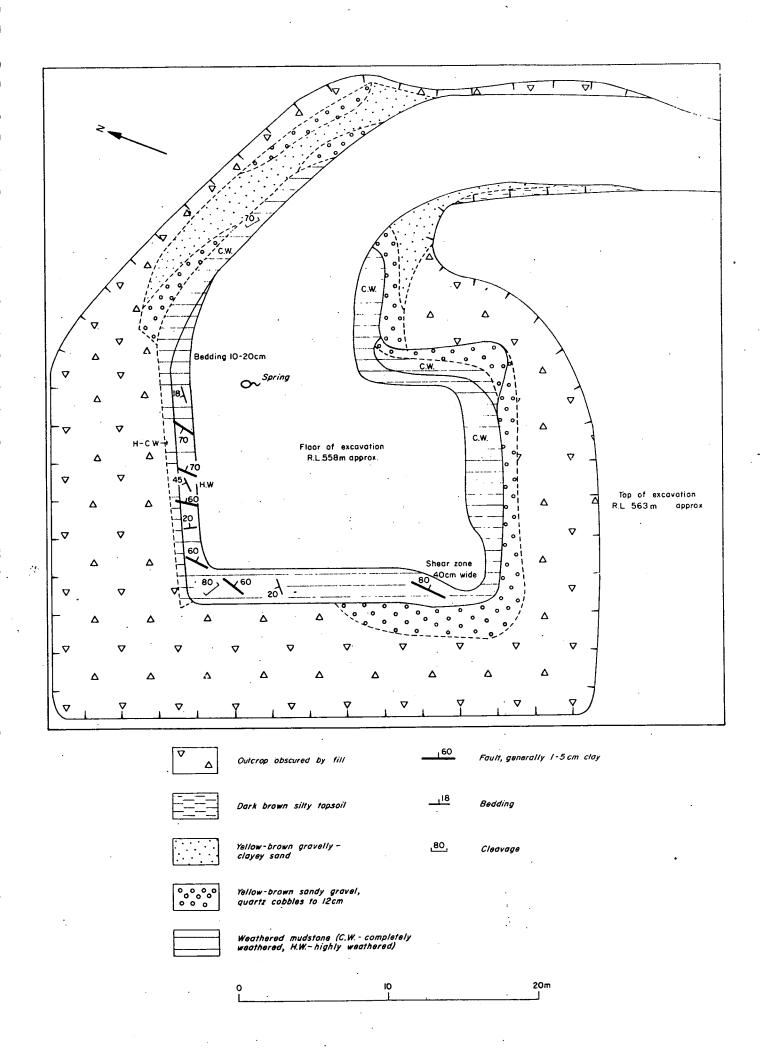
GEOLOGICAL PLAN OF EXCAVATION D.C.T. BUILDING SITE, CANBERRA
